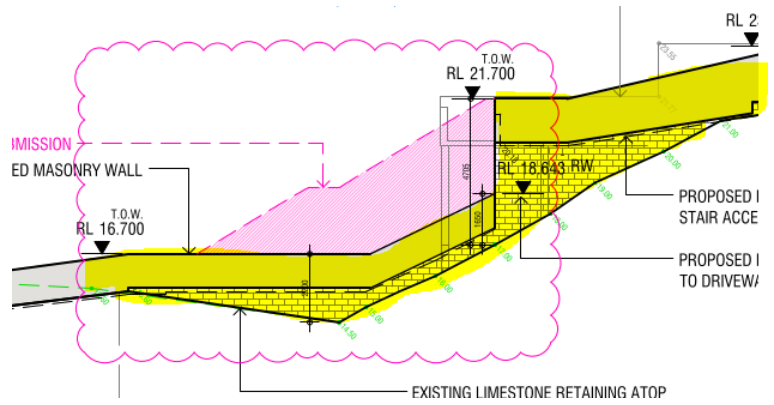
Height of Southern Boundary Retaining Wall with Wall in Pink Being Originally Proposed and Wall in Yellow Being Currently Proposed.
